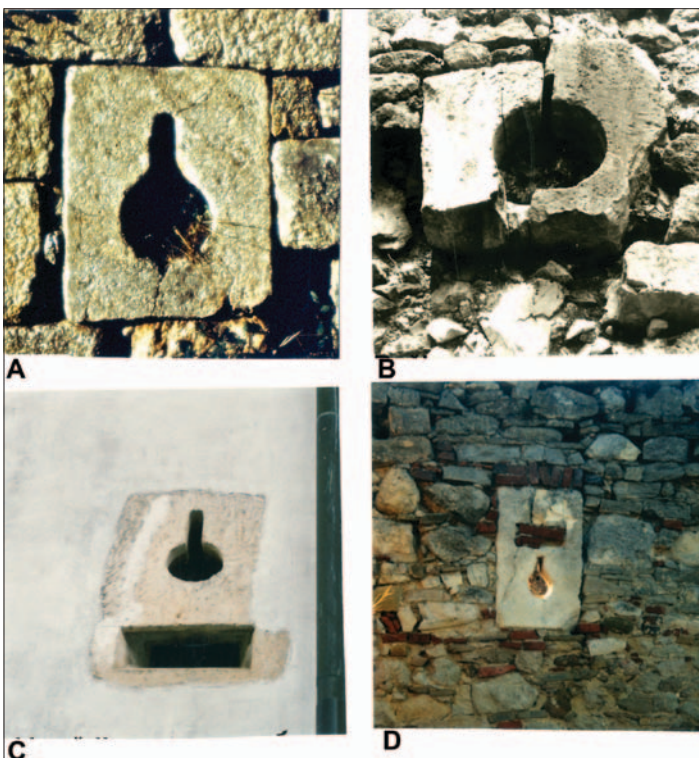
Gun loop openings: A – Brinje, B - Ružica, western wall, C – Stari grad Varaždin, D – Konjščina (photo by: Z. Horvat)
